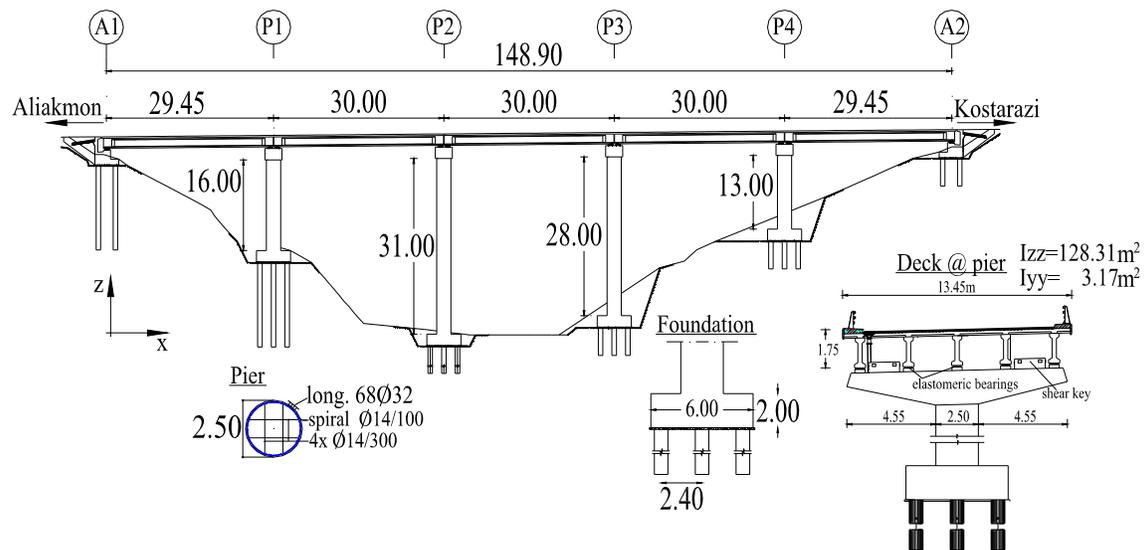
The geometry of the benchmark bridge and cross sections of the pier, the foundation and the deck.
